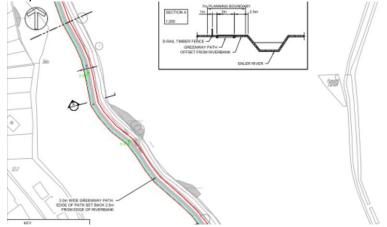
Proposed section of greenway path adjacent to Enler River. Drawing 29.
